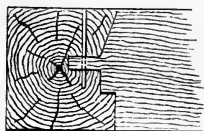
Tusk Tenon Joint with Thick Girder.
